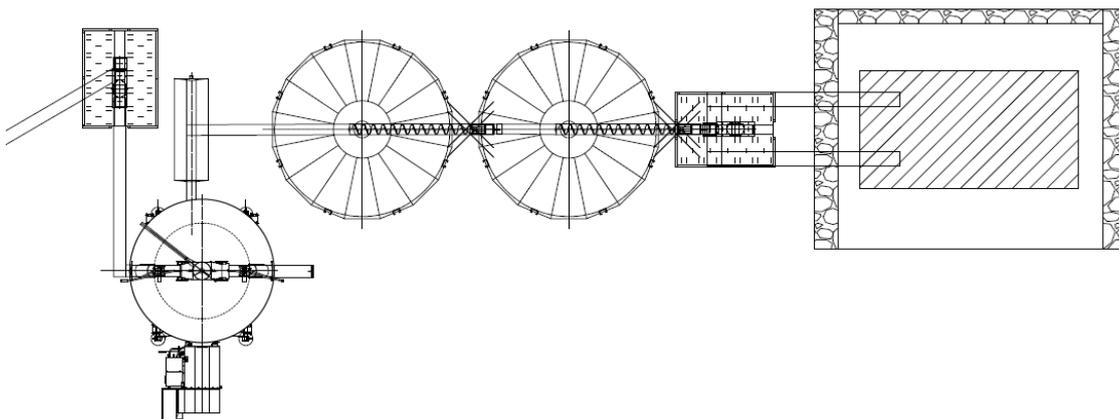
System layout (from right): loading pit, loading elevator, 2 silos x 200 tons, dryer mod. D24, discharge elevator
